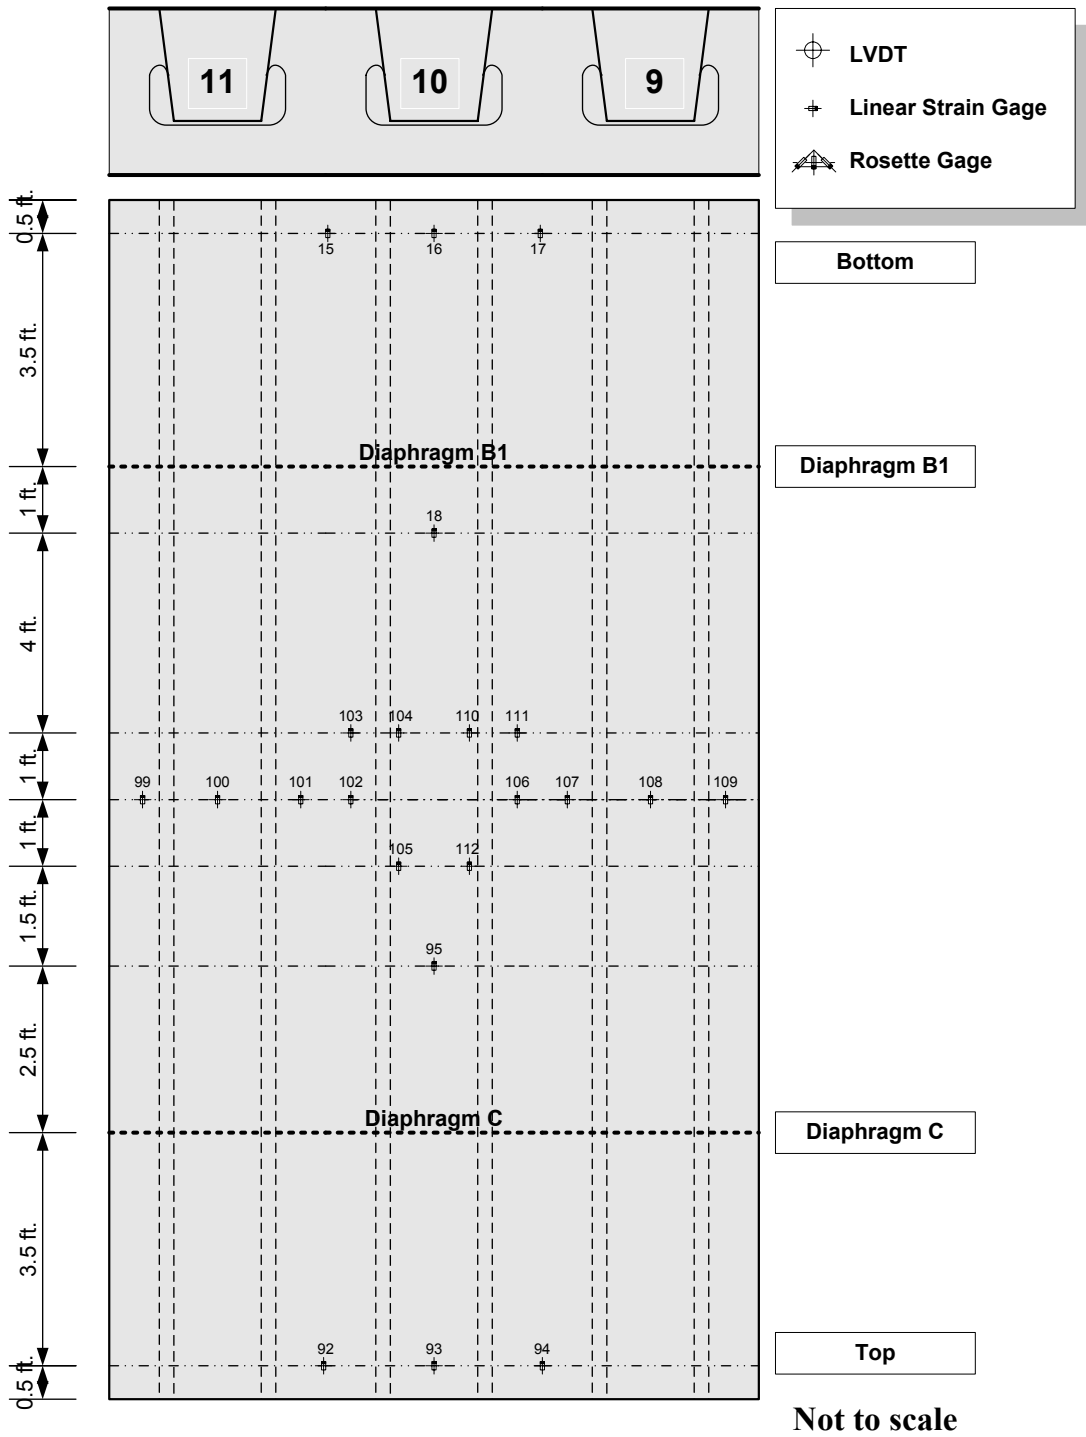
Instrumentation Plan for Triple Rib Beam-column, TBC
